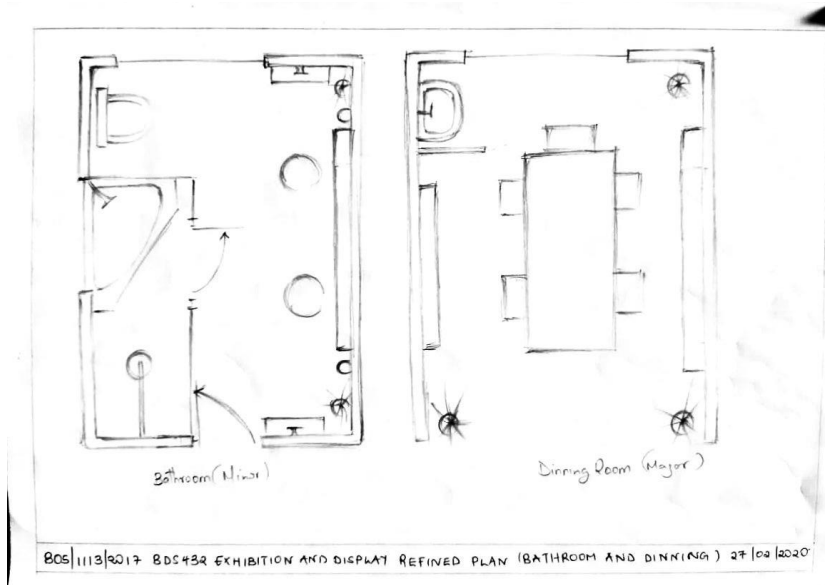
Exhibition and Display refined plan of bathroom and dining (Source; Author)
